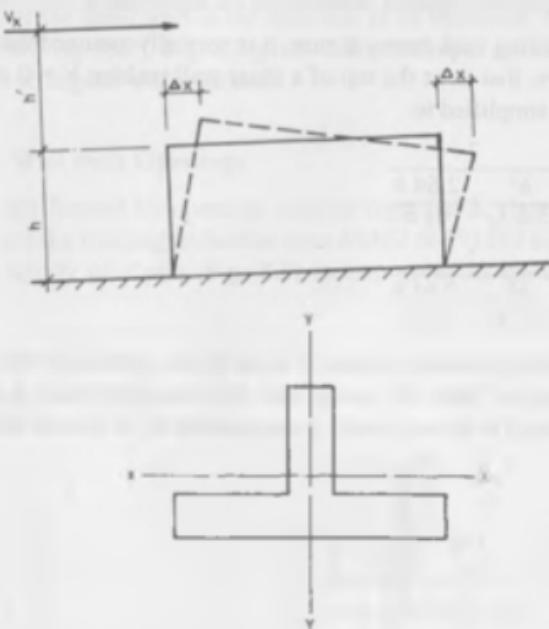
Deflection of cantilever shear wall subject to lateral load.
